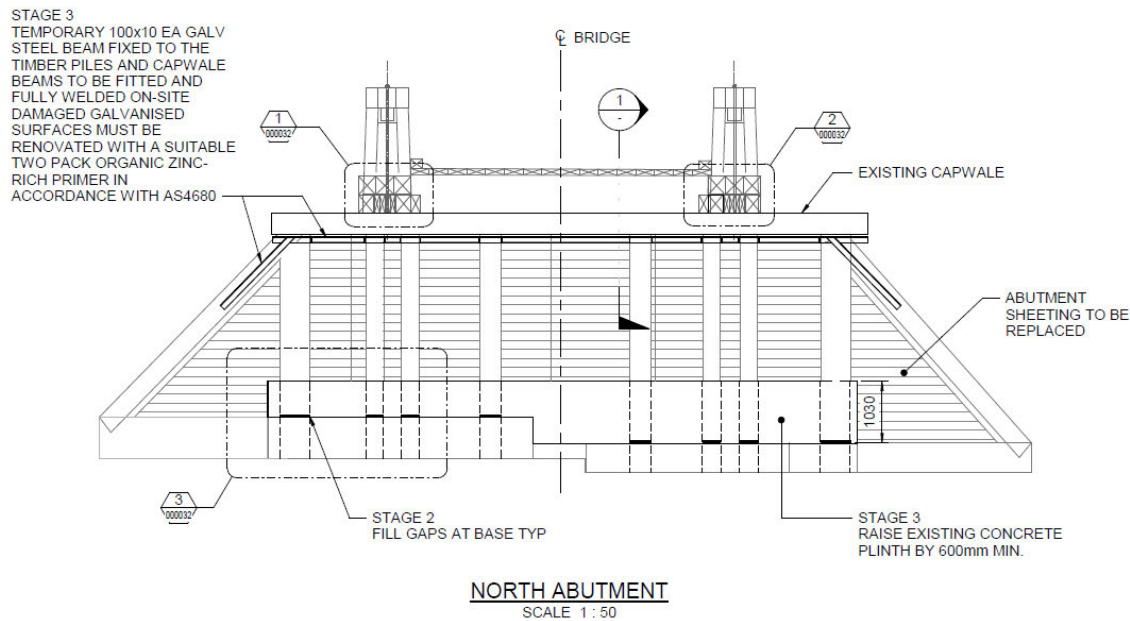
North abutment steel framing installation location (Source: 100% detailed design drawing number 520212TP-AURC-B00390-ST-DRG-000013)
